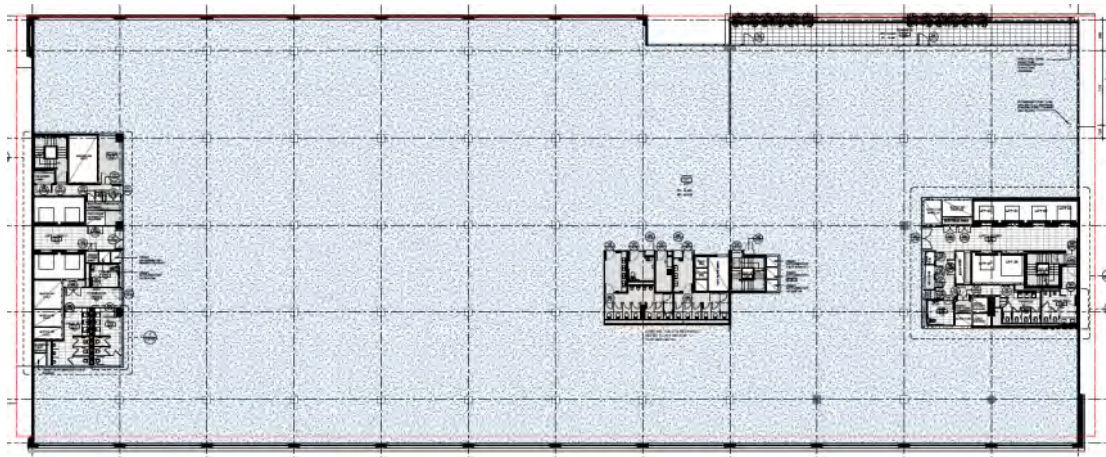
Proposed Level 4 Plan. From Drawing A21-040
